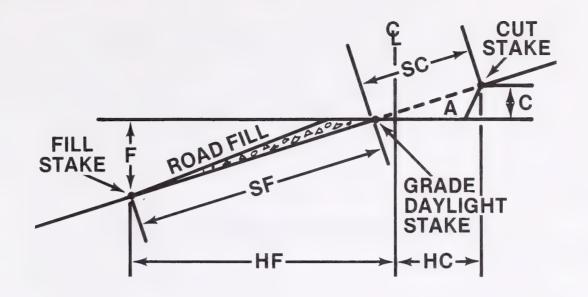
Road prism dimensions for slope stakes and end areas.
